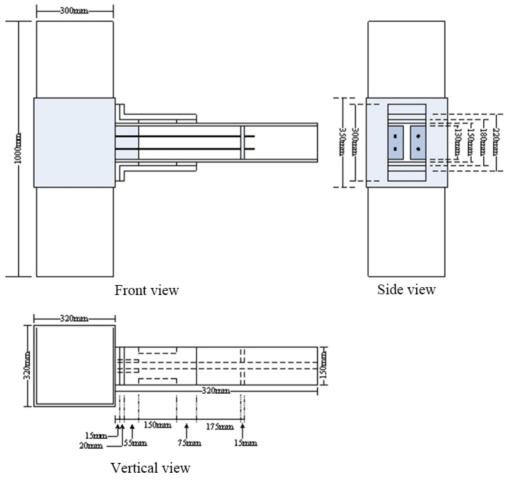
The three-view drawings of the self-centering RC column-steel beam joint specimen
